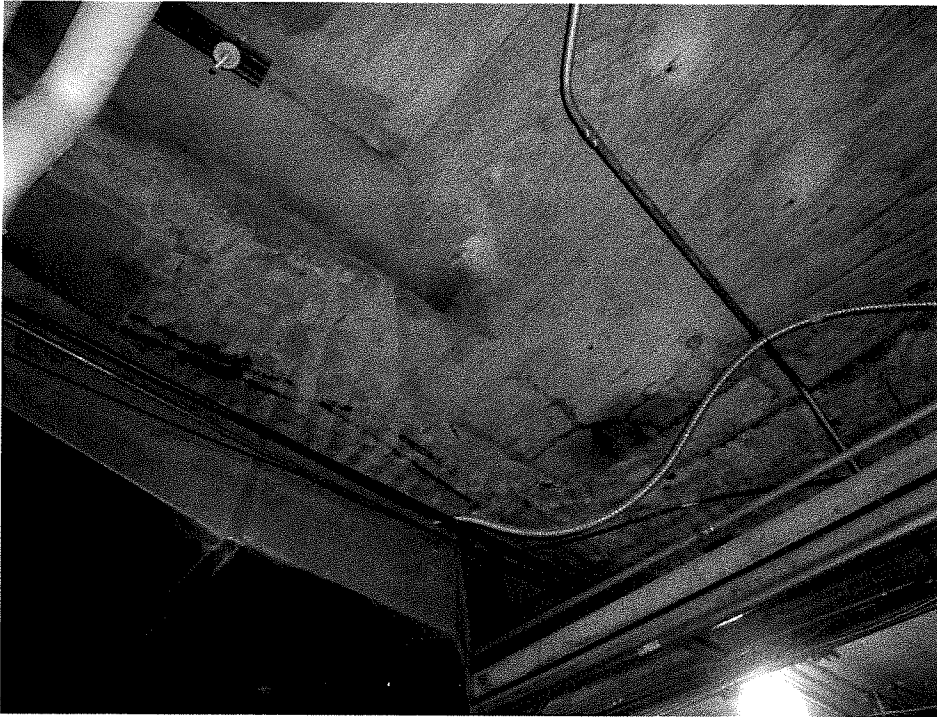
Parkade Ramp – Previous concrete repair patch in storage room west of mechanical room below entrance ramp. Showing signs of cracking and moisture infiltration.
